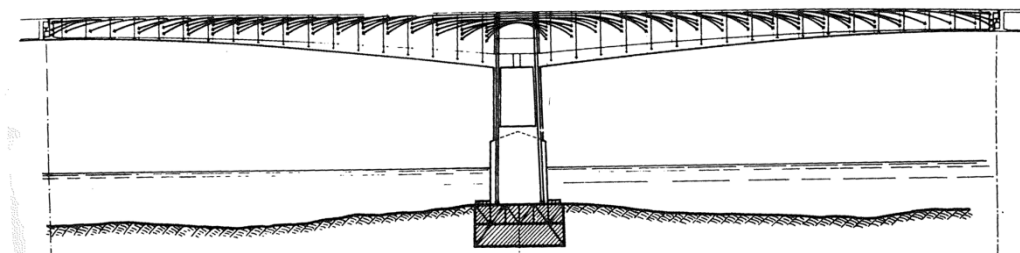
Principle for placement of the prestressed reinforcement in a balanced cantilever bridge¹⁶
